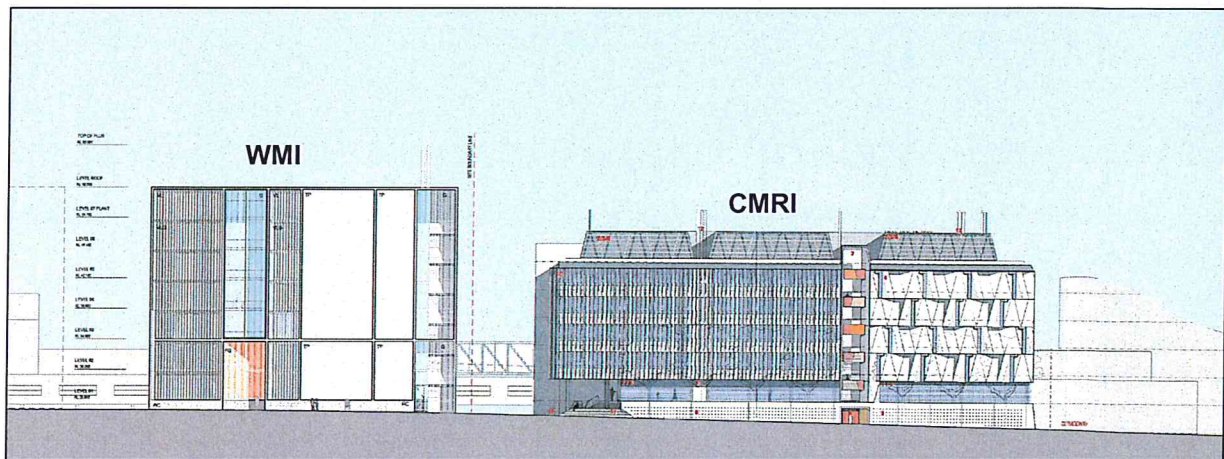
Hawkesbury Road elevation of WMI and CMRI buildings (as approved)
